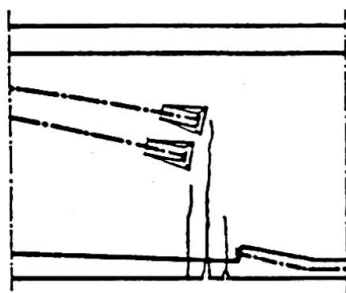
TENDONS ANCHORING WITHOUT OVERLAPPING
